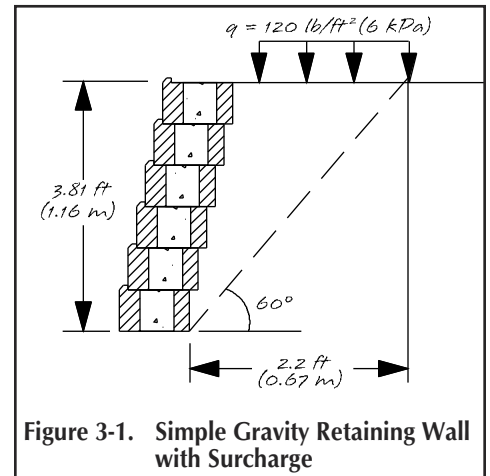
Simple Gravity Retaining Wall with Surcharge
